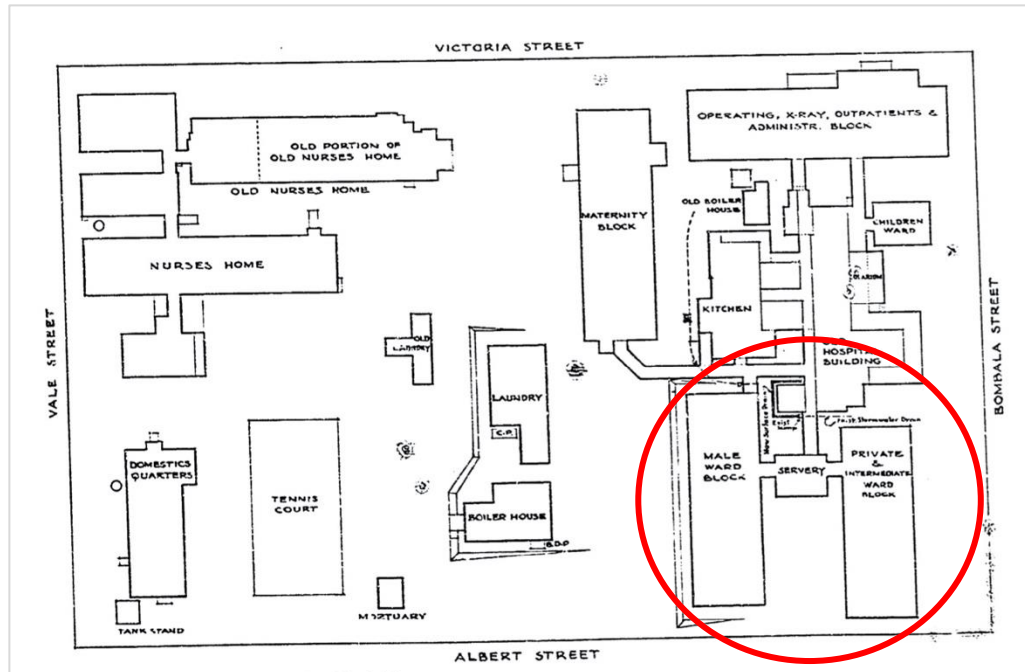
c1950s block plan for the Cooma Hospital, included in undated and unsigned drawing for "remodelling of existing hospital building", showing the location of existing and proposed new buildings at the hospital site. (Source: NSW Plan Services (PWA), PH52-32 – Cooma Hospital – Existing Building Remodelling – Site & Floor Plan – Elevations & Sections)
